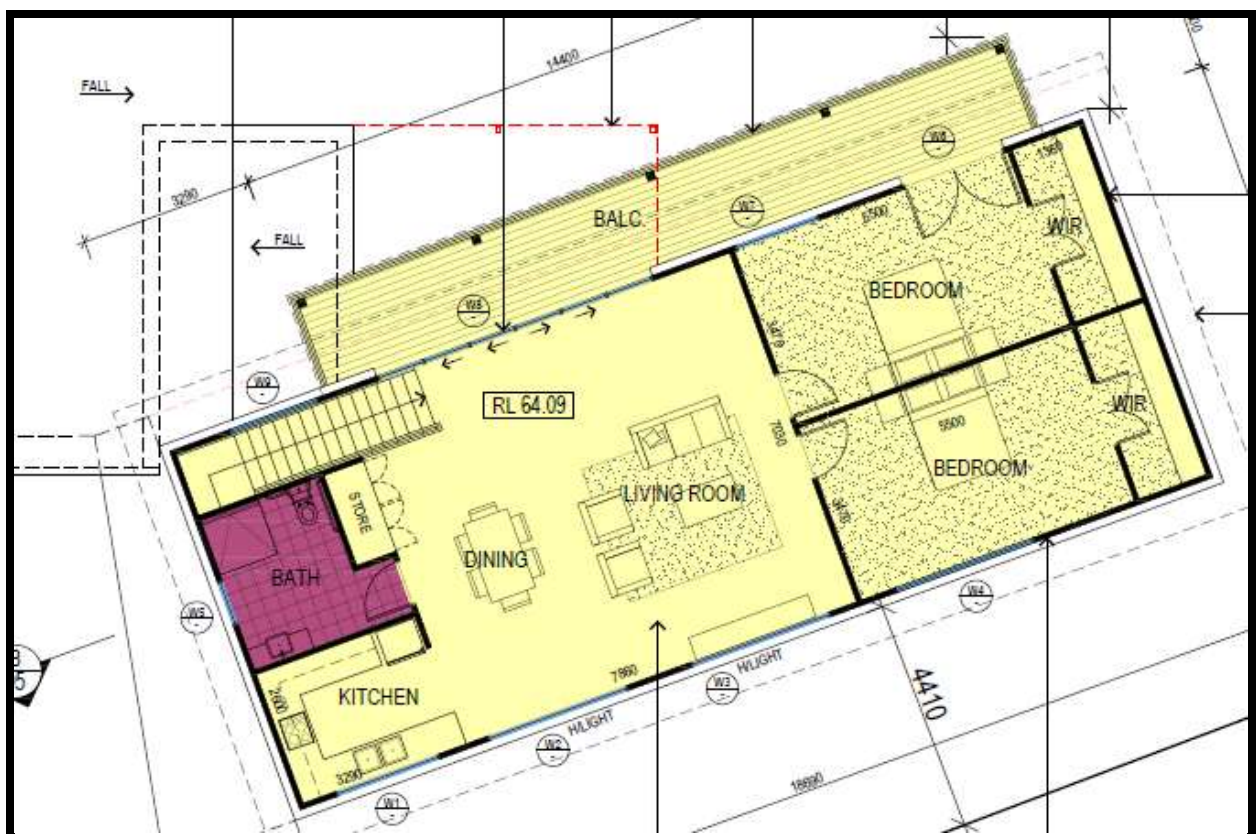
Proposed new first floor addition (Source: Innovate Architects 2019).
